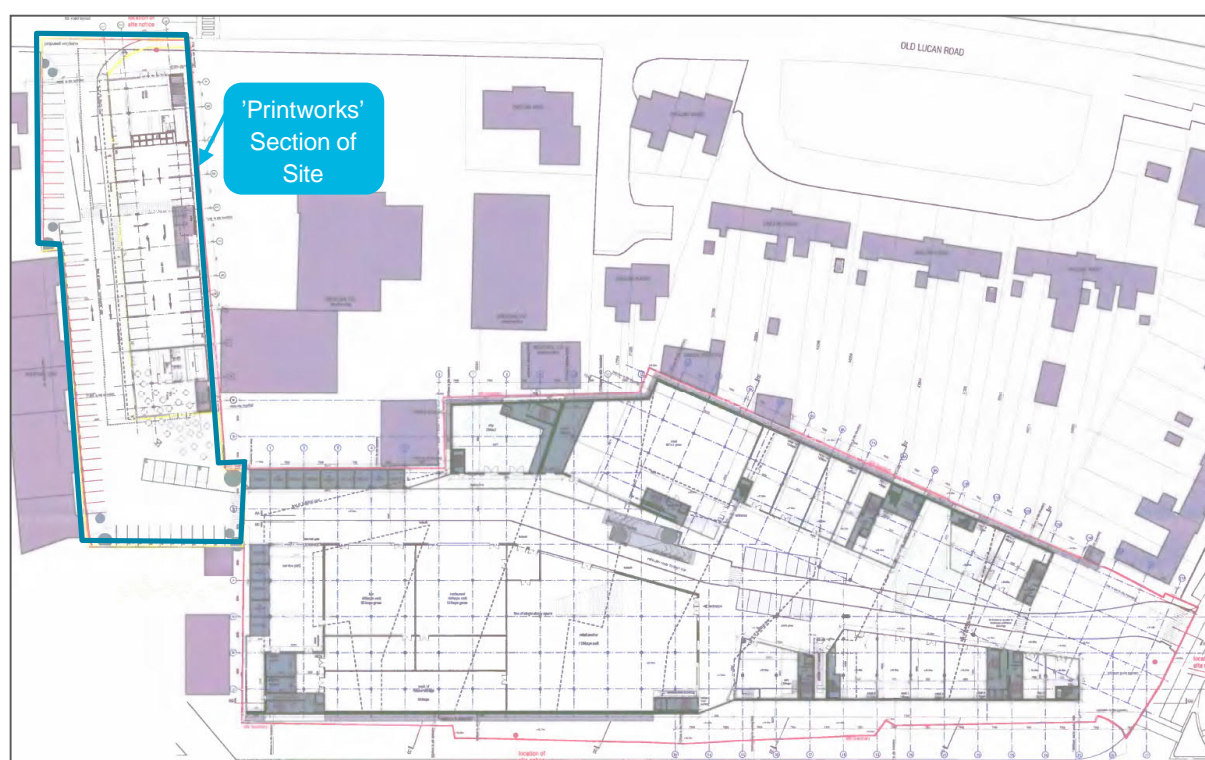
Site Layout Ref SD09A/0021 (Additional Information Stage)
